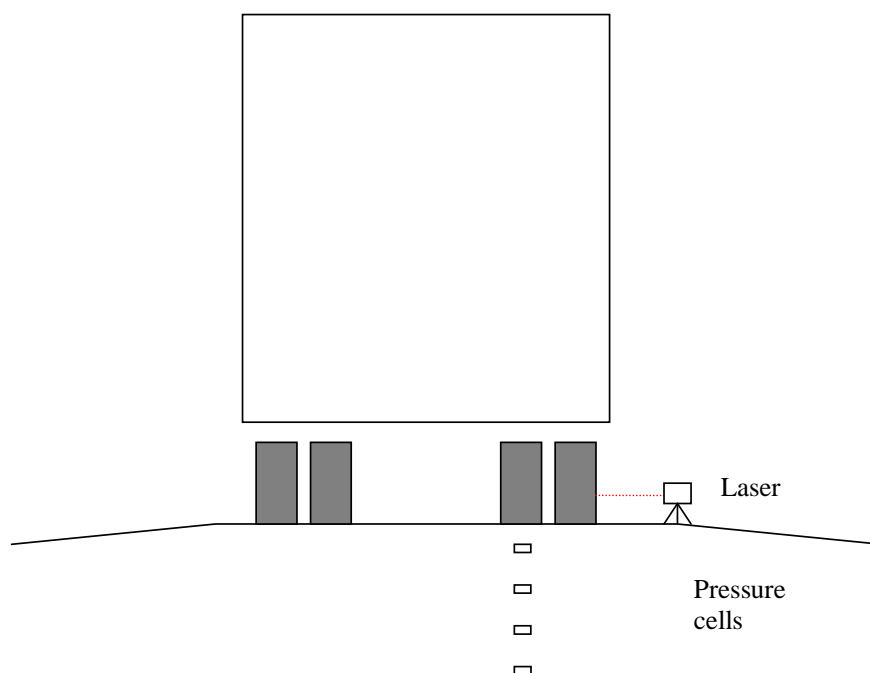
Schematic instrumentation plan in Stynie Wood
